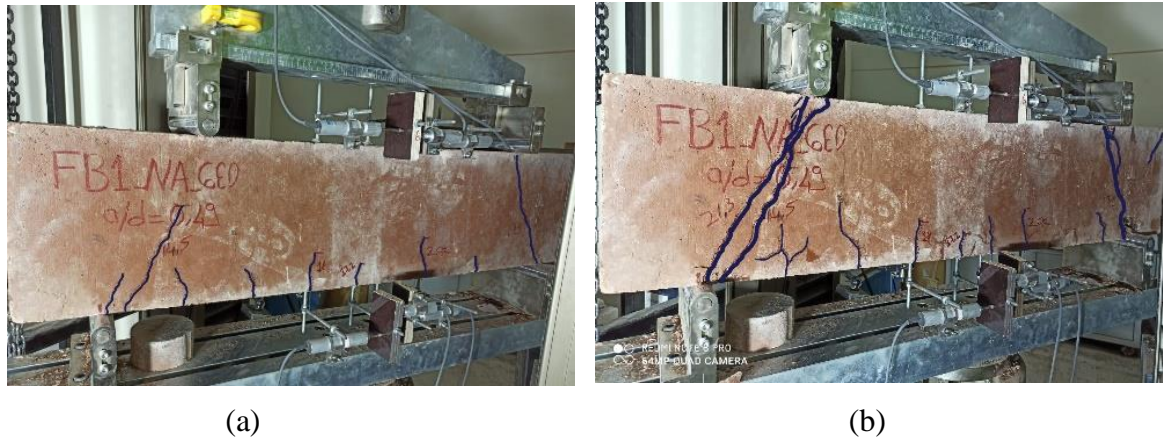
GPC – NA – 0.50 beam, (a) first cracks, (b) failure
